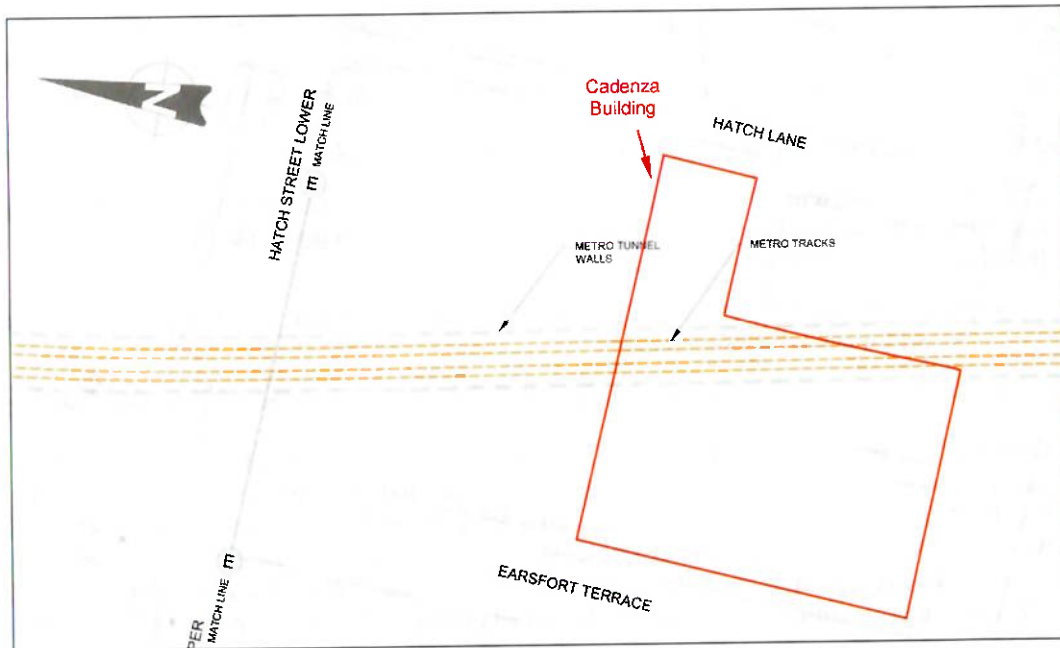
Design tunnel alignment from RO Alignment Drawings
